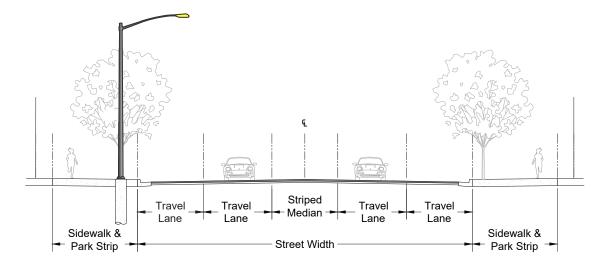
Typical Collector with Street Lighting at Intersections Only Cross Section
